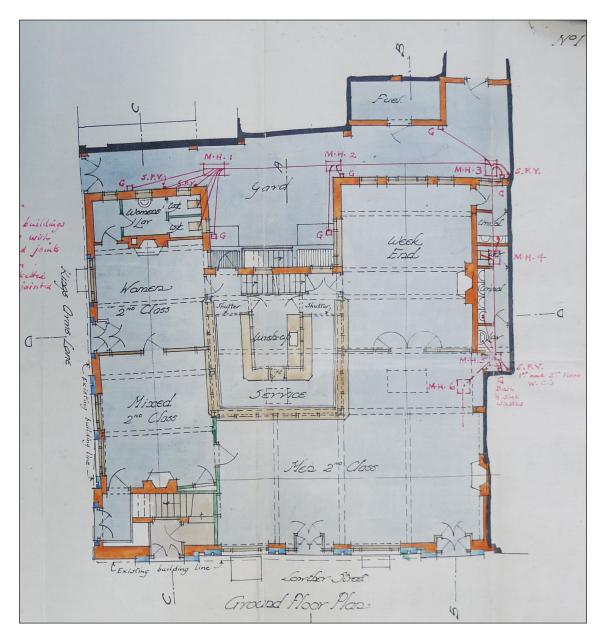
Ground--floor plan of the Apple Tree, Lowther Street, Carlisle, drawn in 1925 (CACCCA/E/6/1/3 Reproduced under the Open Government Licence)
